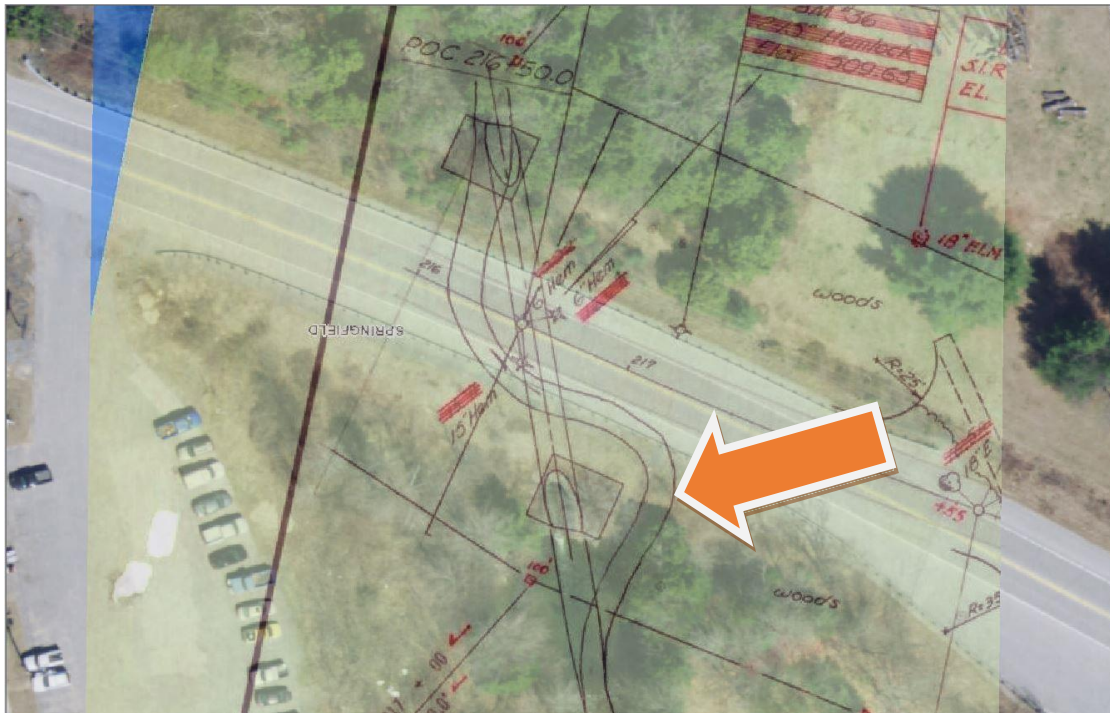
Original 1958 Roadway Plans Overlaid (note cut-off brook meander)
